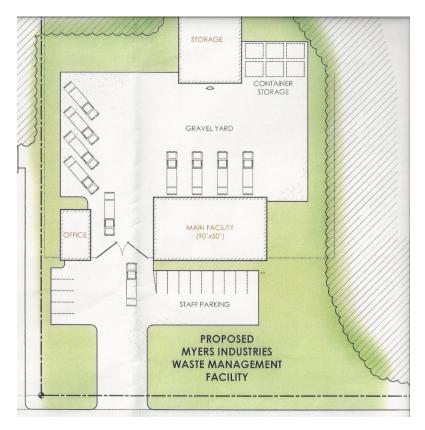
Proposed Site Layout - Myers Industries - Business Park Location
